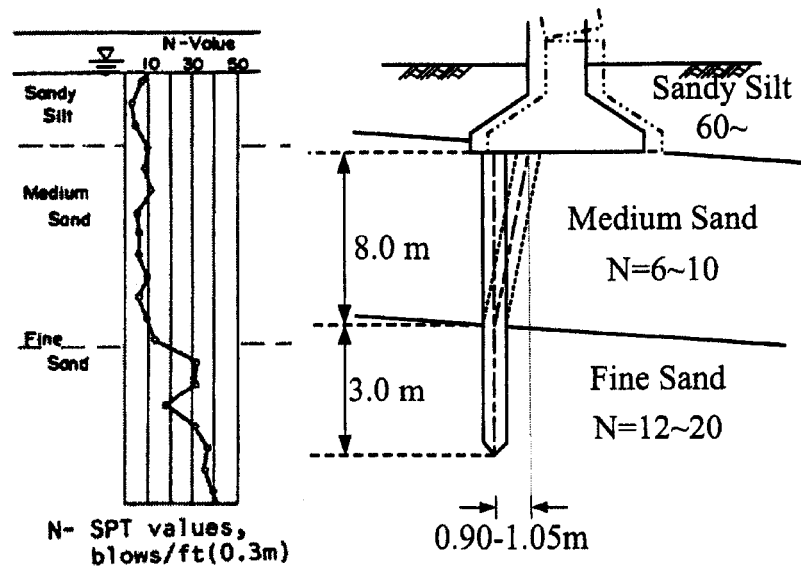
Pile foundation failure of Yachiyo bridge due to kinematic loading - after Hamada (1992)
